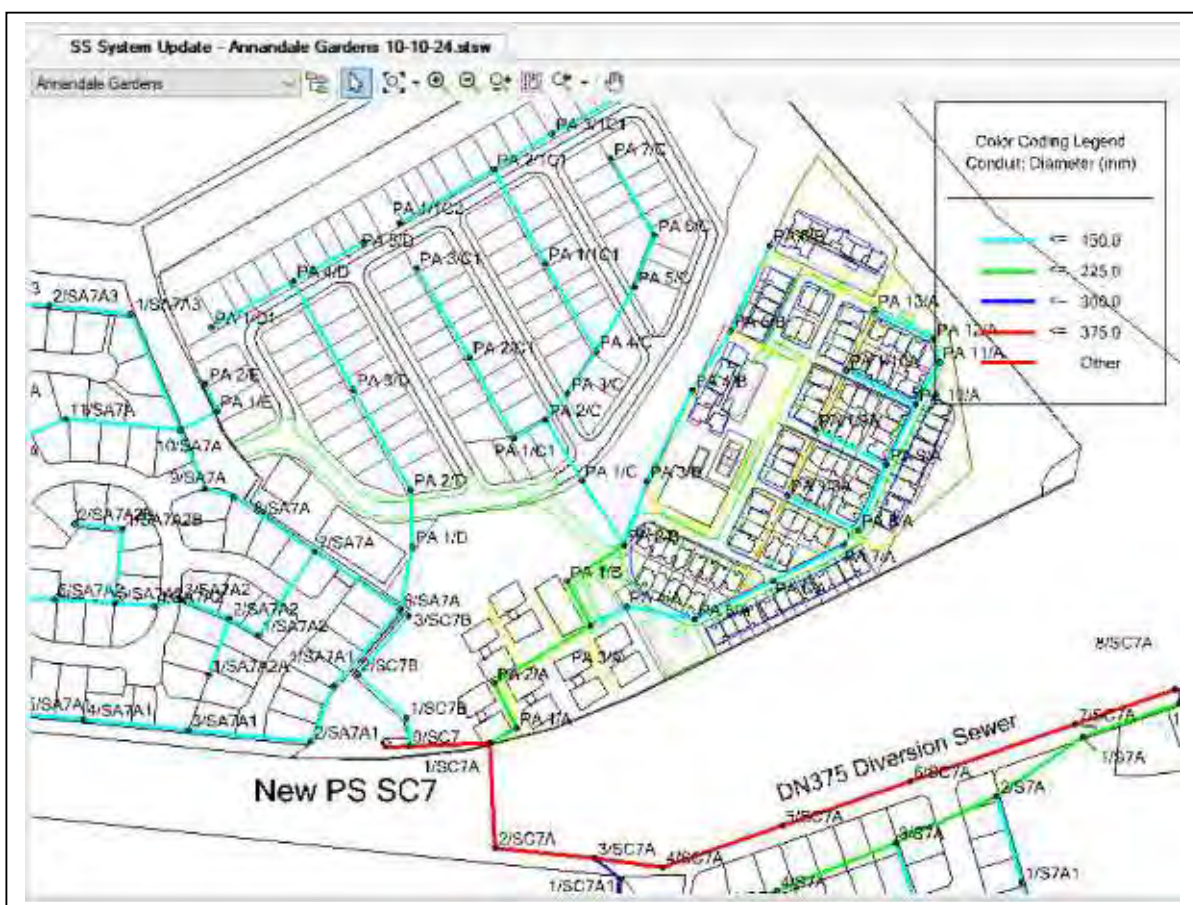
Preliminary Retirement Village Development Sewer Layout
